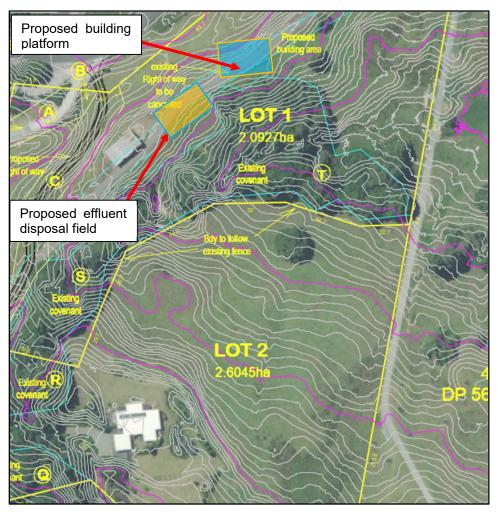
Proposed subdivision plan (Williams and King Ltd).
